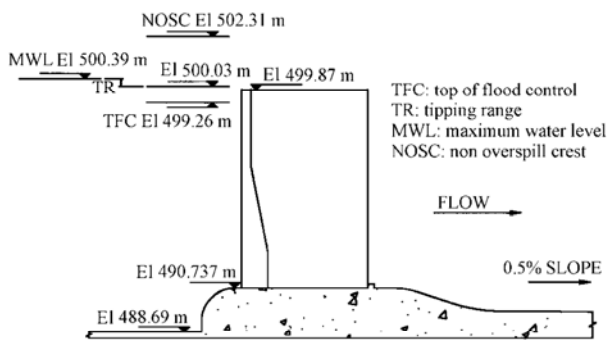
Canton dam: typical cross section through the spillway with key elevation
